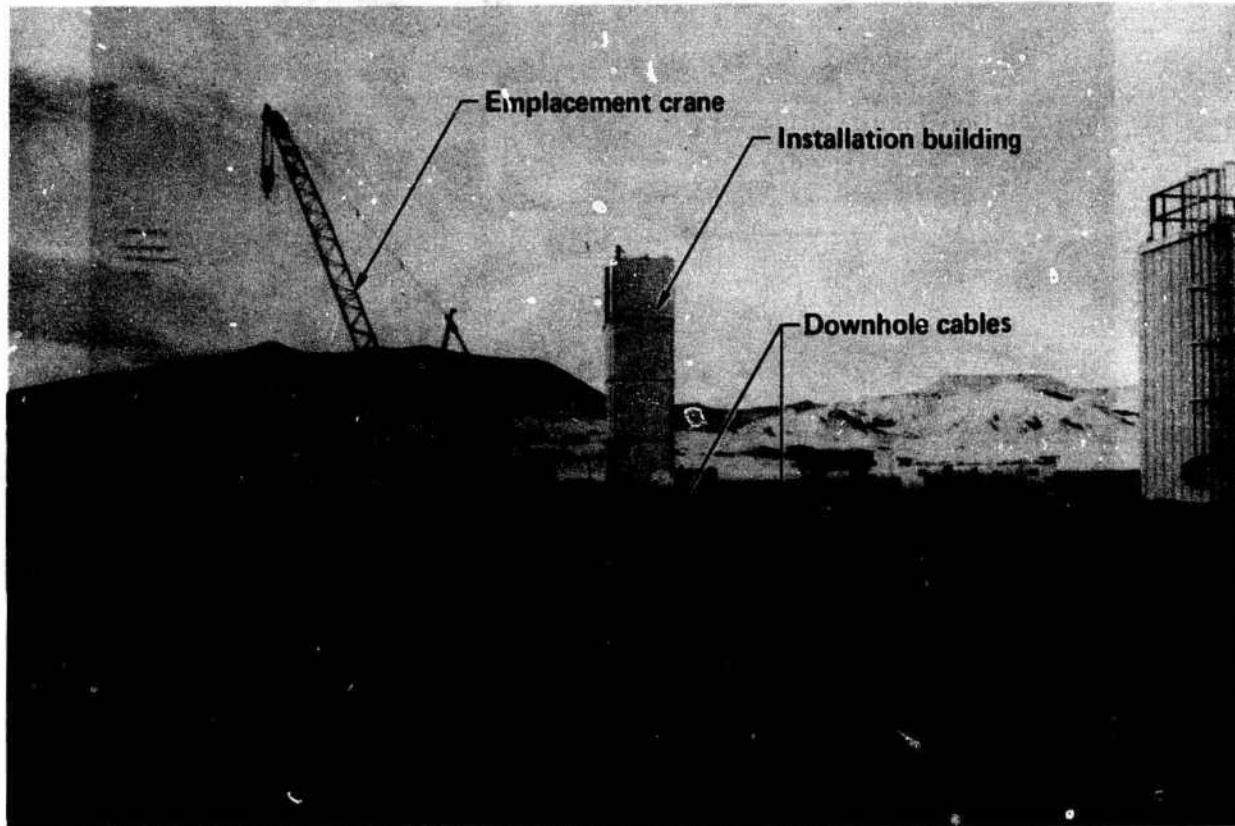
Ground-level view of G8, showing installation building, emplacement crane, and cable runs.
